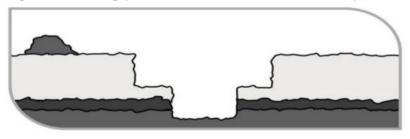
Benching with Battering (source: Code of Practice – Excavation)
